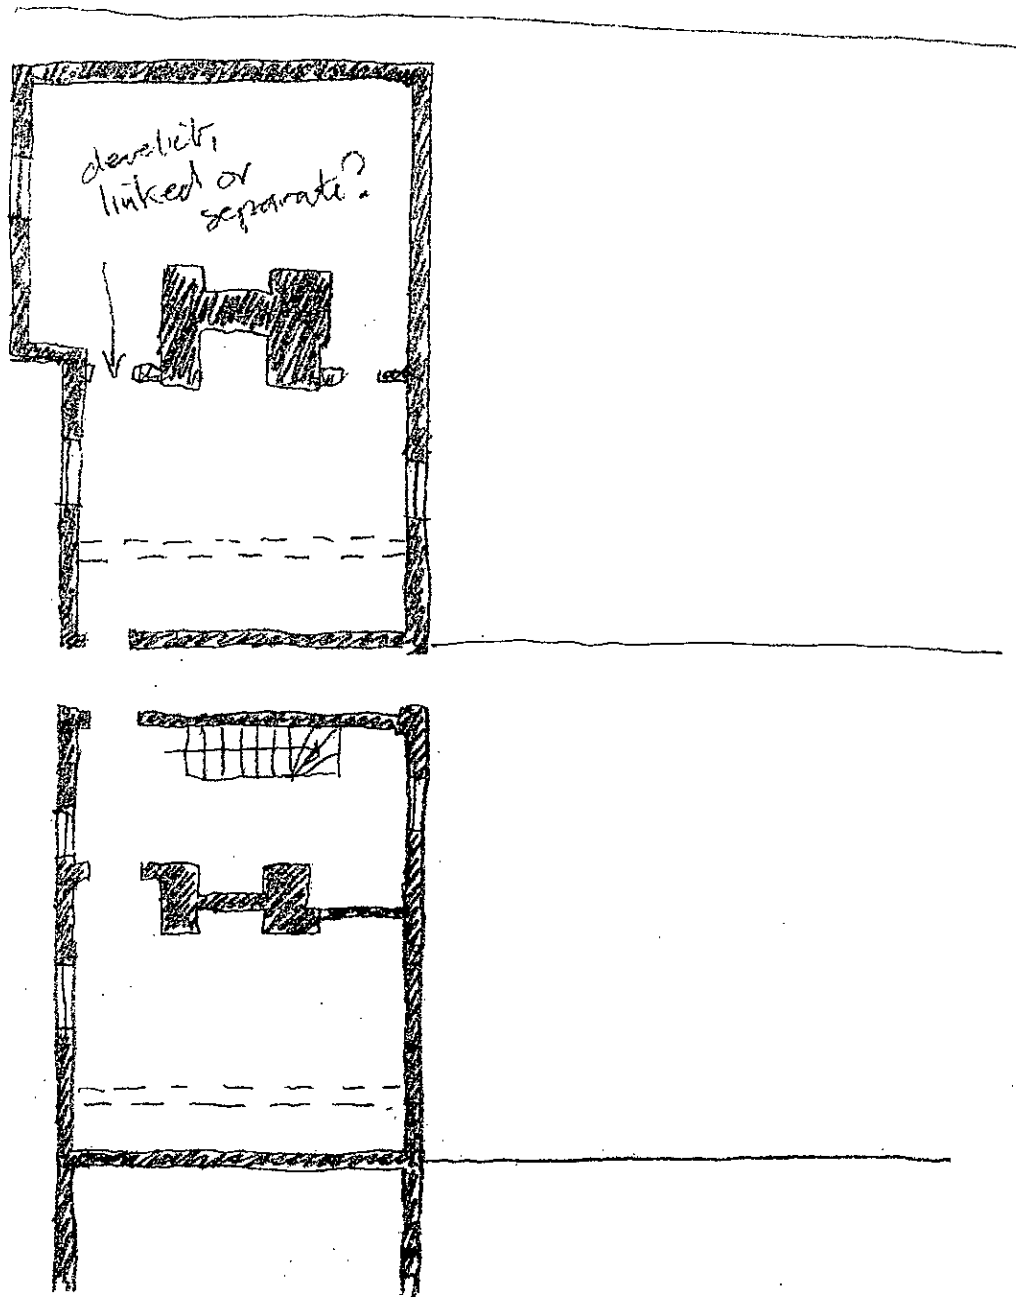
; sketch reconstruction of the eighteenth-century ground floor plan.
